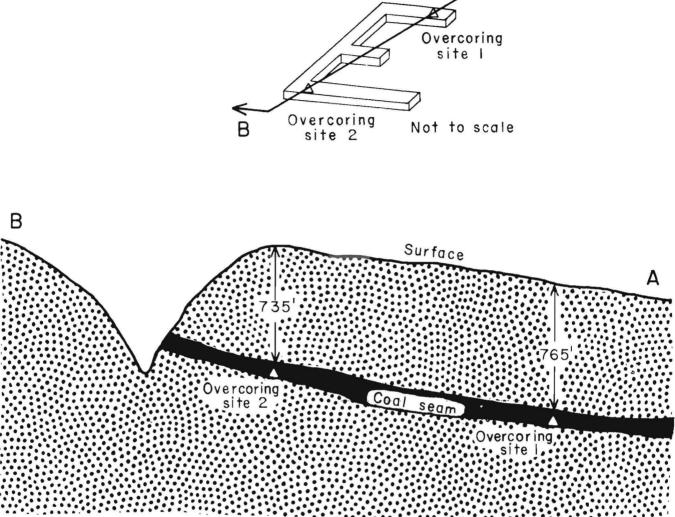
Cross section of the Rienau No. 2 Mine showing site location to topography.
